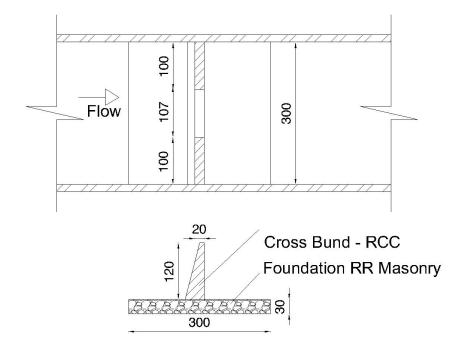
Typical Cross - section & Plan of Silpolin Tank
